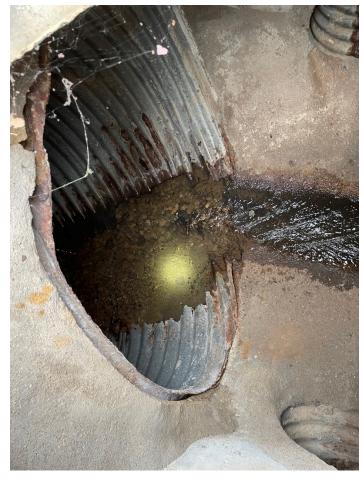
(7/7/21) – Junction box on Valley north of 4H looking downstream NOTE: bottom is rusted out under 4H road as well.
